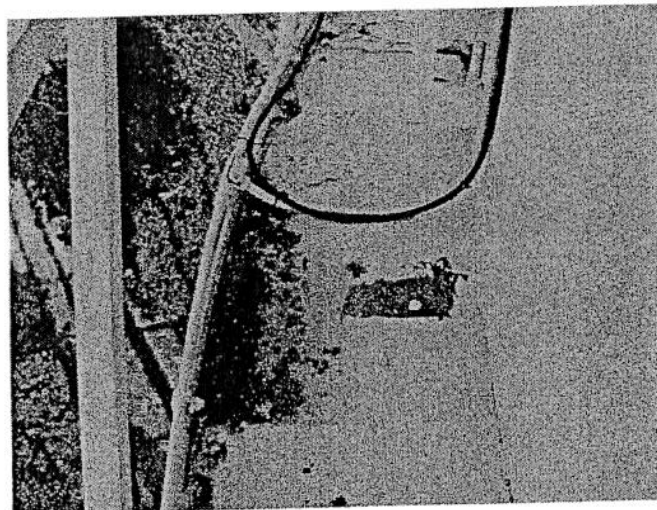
Exterior Coating System on the balcony are beginning to fail.
